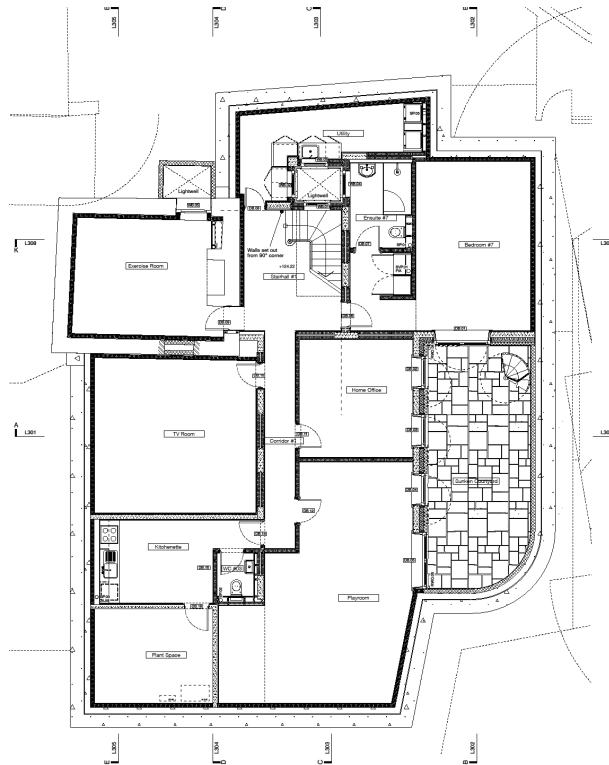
Proposed Basement Floor Layout at Grove Lodge
